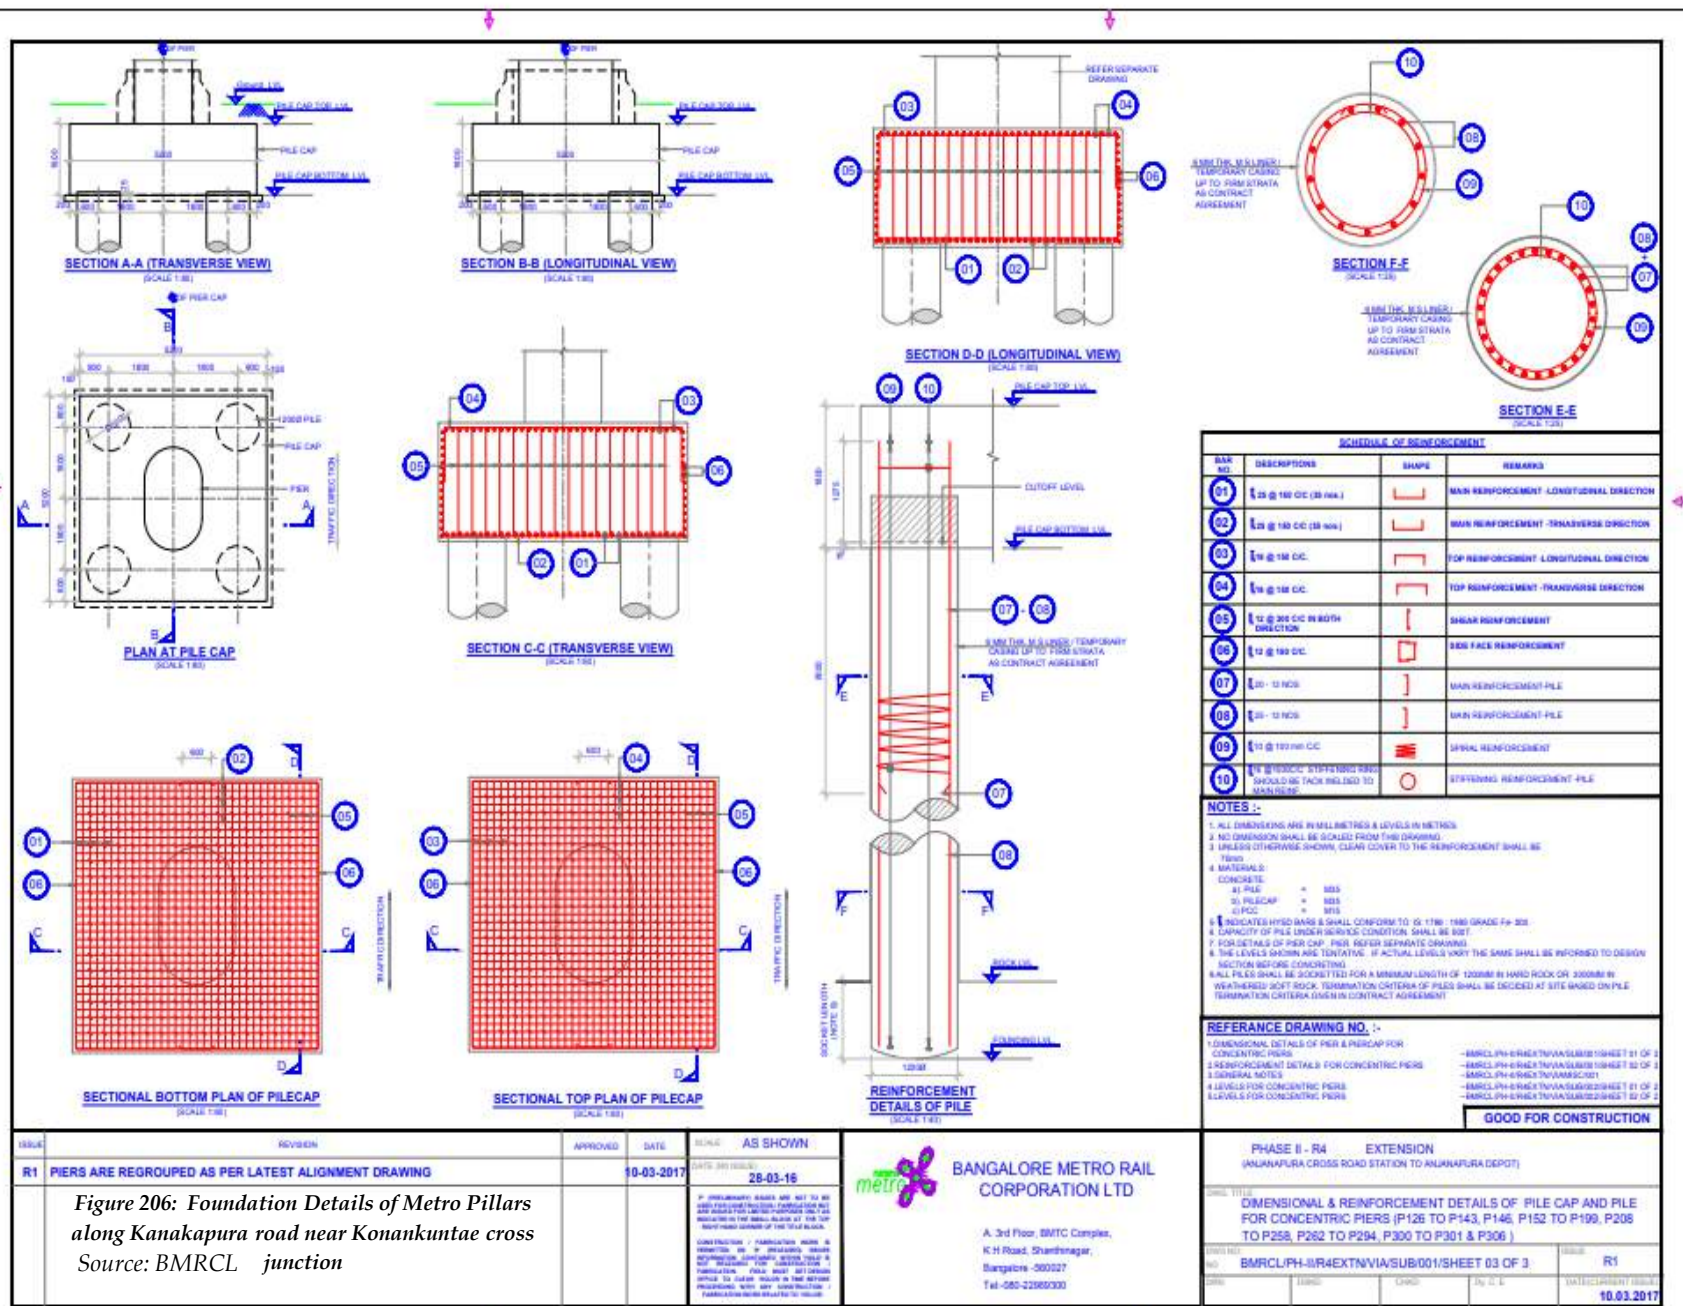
Foundation Details of Metro Pillars along Kanakapura road near Konankunte cross
